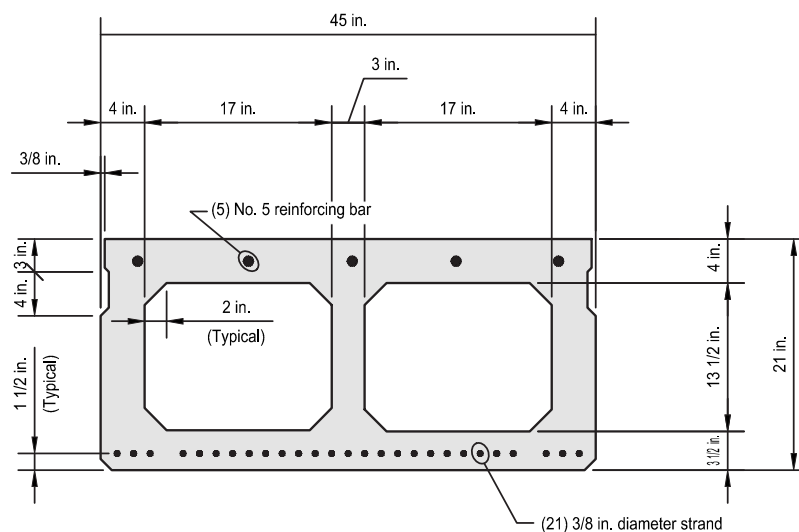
Box-beam cross-section geometry. Note: no. 5 = 16M; 1 in. = 25.4 mm.
